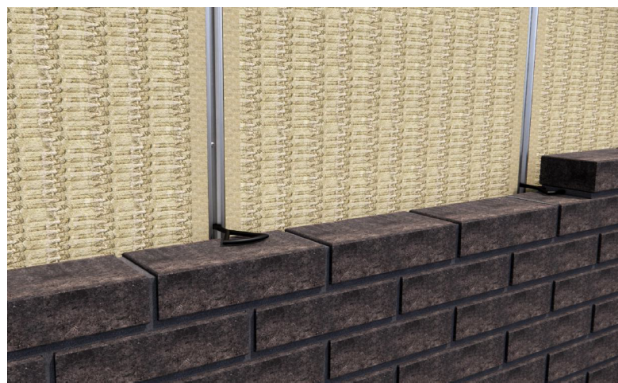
Wall ties attached to a rail (Rockwool, 2023)
